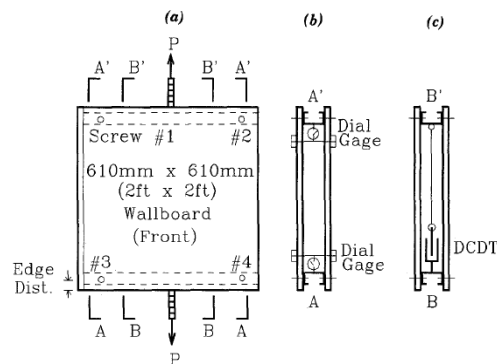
Wallboard fastener connection setup by Miller and Pekoz [5].
